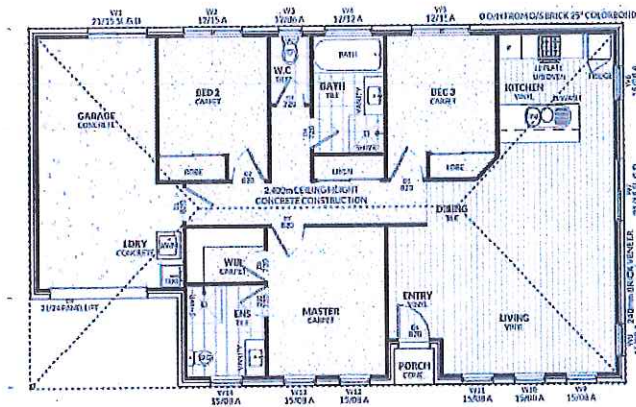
Proposed floor plan with roof shown dotted, as per application.
